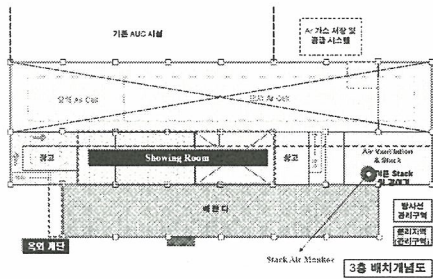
Detector Location in the Third Floor of the PRIDE Facility.
